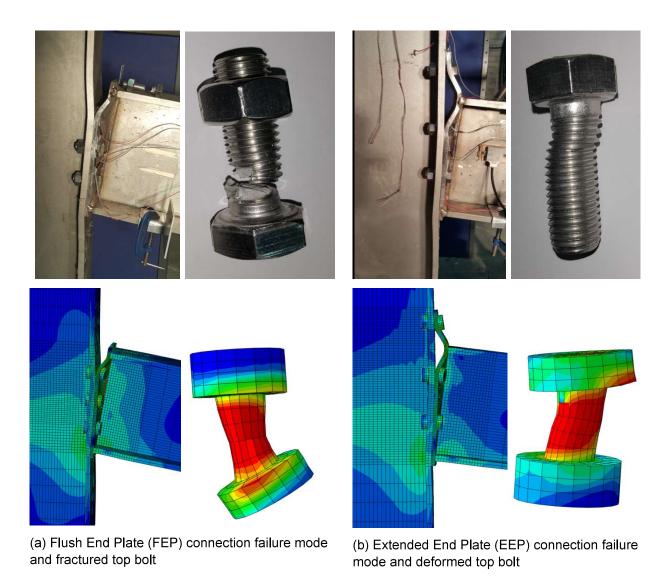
Experimental and numerical failure modes of FEP and EEP joints and close-up of bolt at failure
